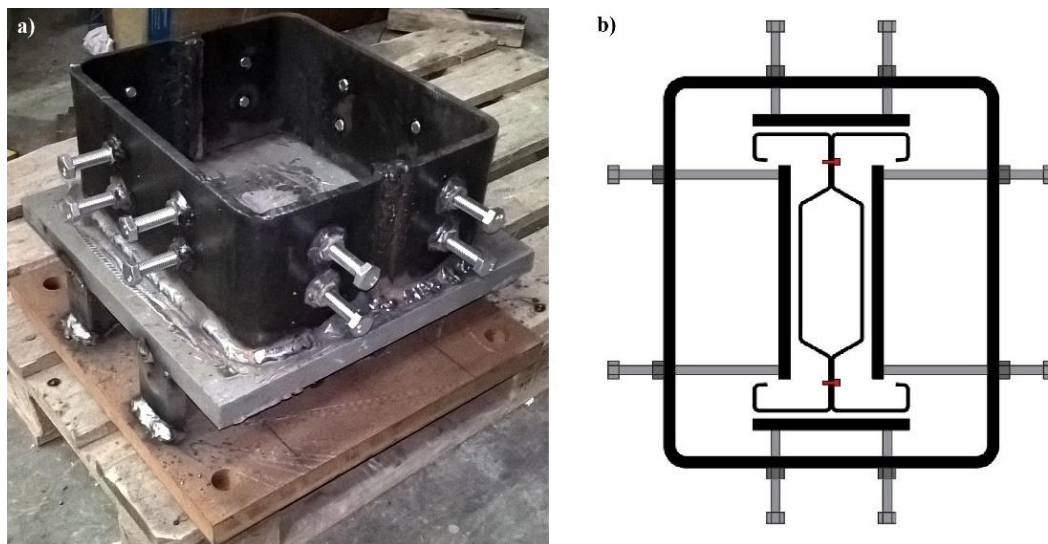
a) End-support device and b) Schematic of the adjustable system adopted to fix the tested specimens
